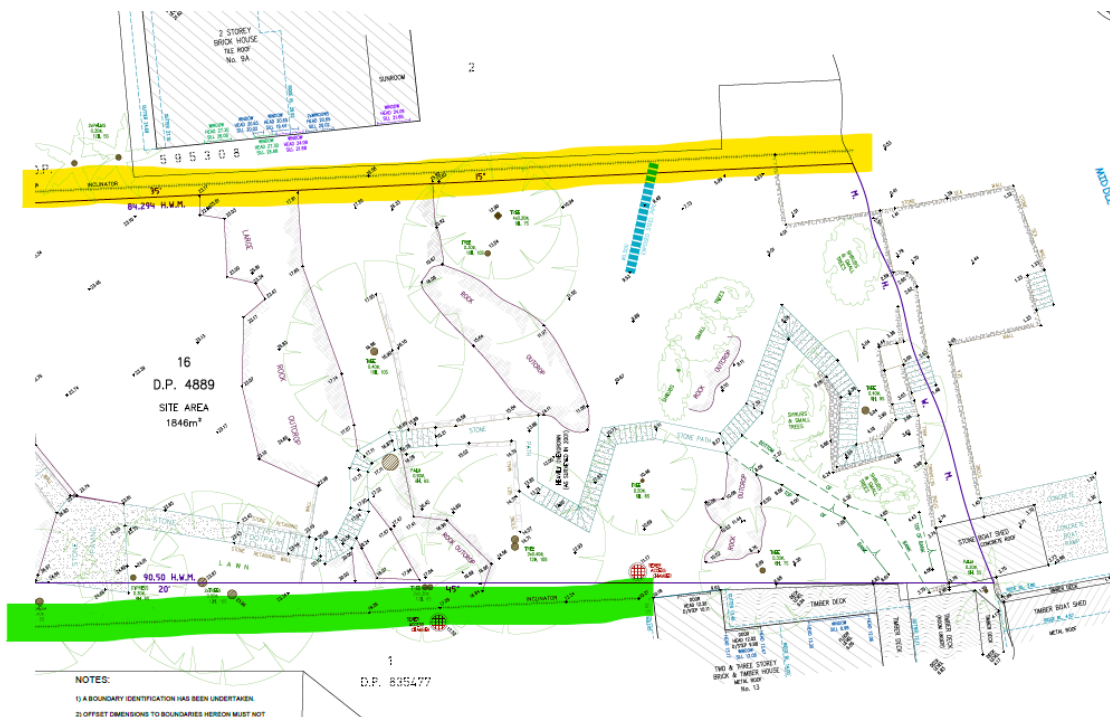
the adjacent dwelling houses are developed with Inclinator as shown above
